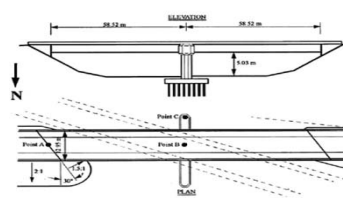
Elevation and Plan Views of 91/5 Over-Crossing
